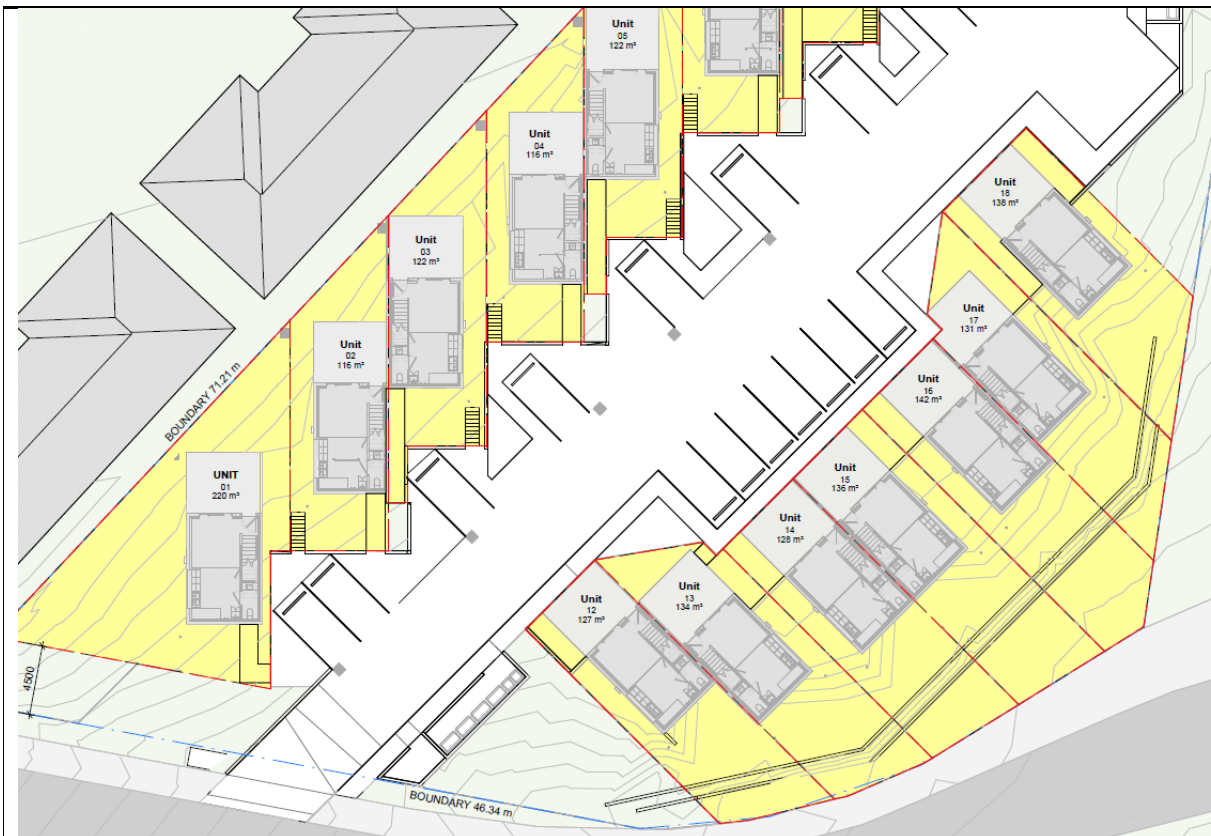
Extract from Open Space Diagrams – Individual Lot Area, as prepared by Jaws Architects drawing no. DA-04. The red lines showing proposed fencing starting towards the rear of proposed unit 12 and 4.5m from the sites frontage adjacent to unit 01.
